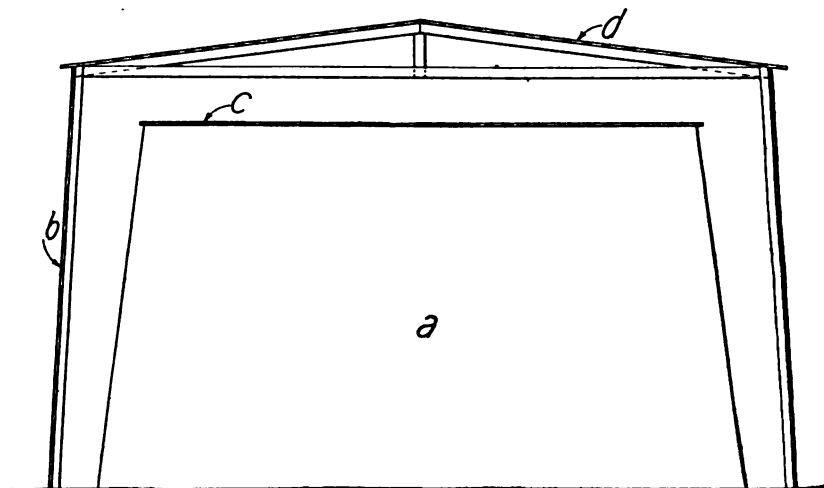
Wood housing for 1,600-barrel lease stock-tank to decrease the circulation of air: a, 1,600-barrel wood-stave stock tank; b, 1-inch board; c, 1-inch boards laid across top of tanks; d, 1-inch board roof.
